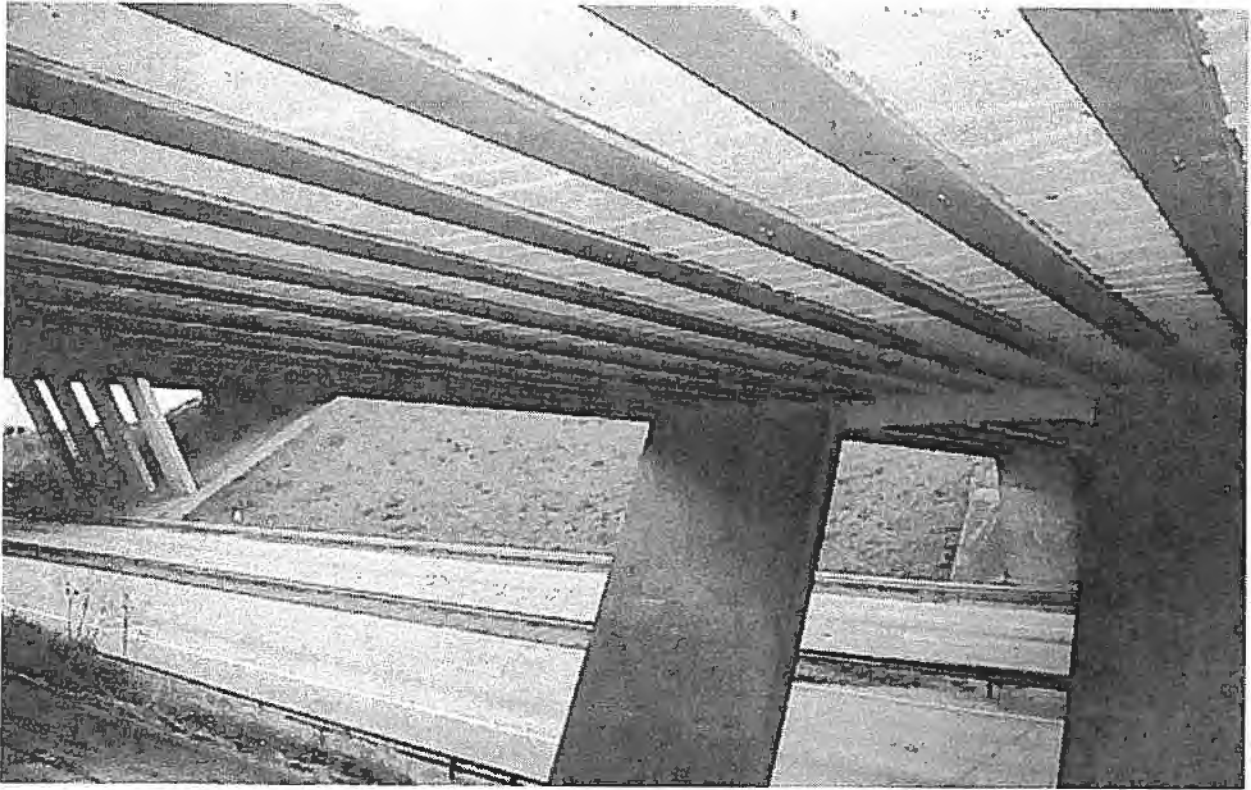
The soffit of a motorway bridge, strengthened by epoxy bonded steel plates. In this case the concrete slab needed strengthening due to lack of reinforcement. Bonded steel-to-steel as well as steel-to-concrete connections are used.
